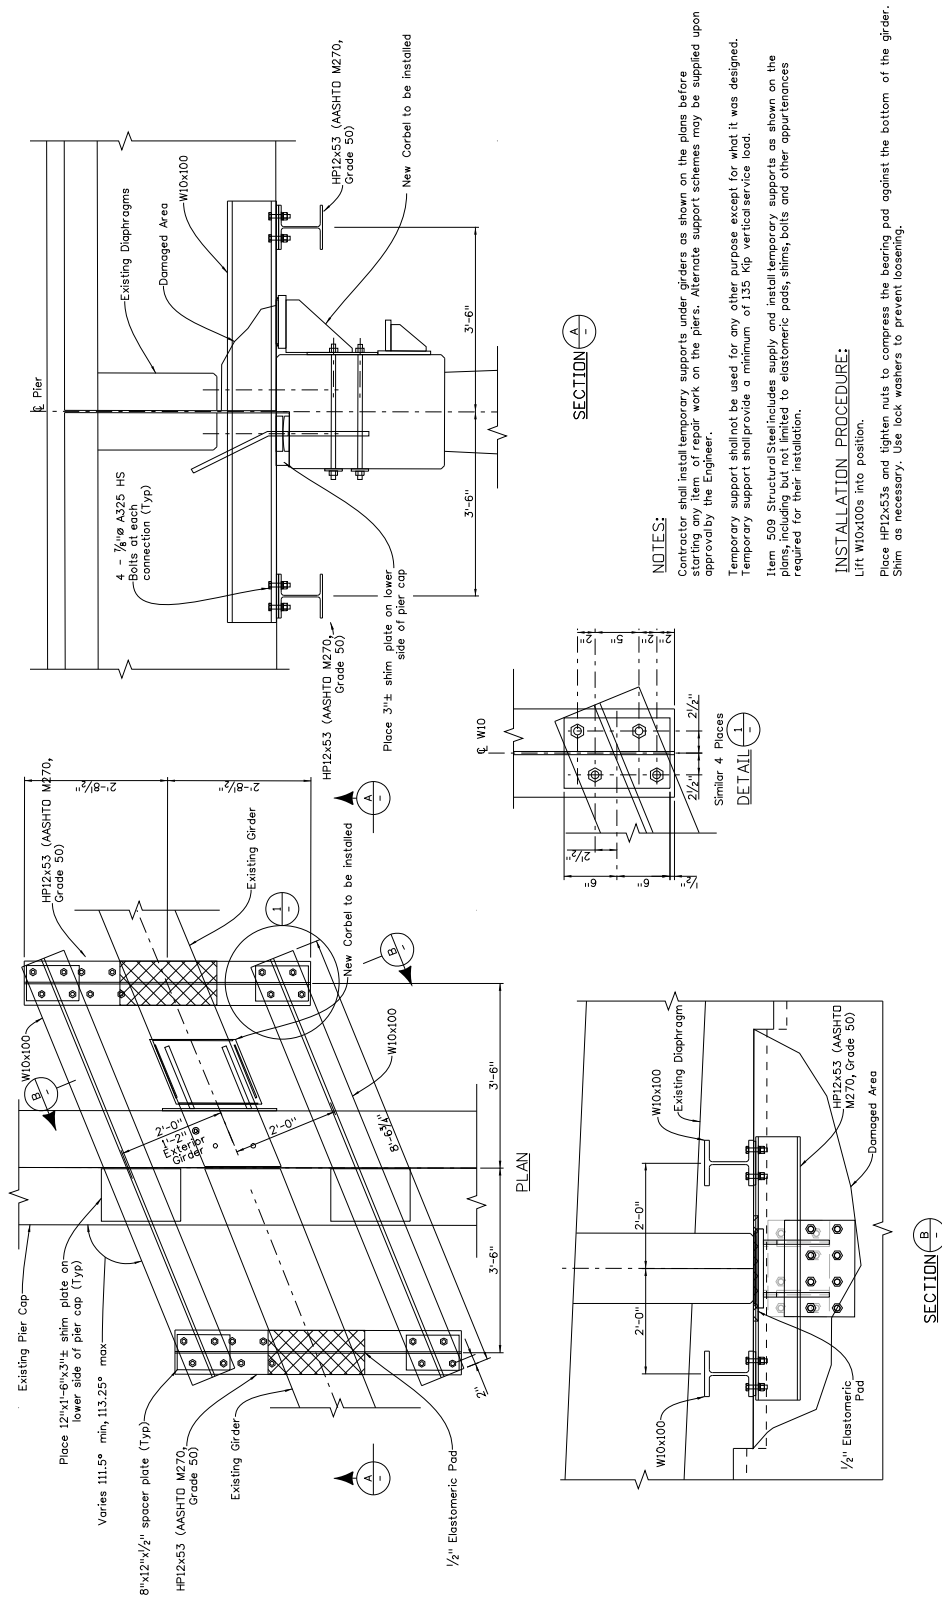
(I)-6 Sample Details of Straddle-Type Falsework
